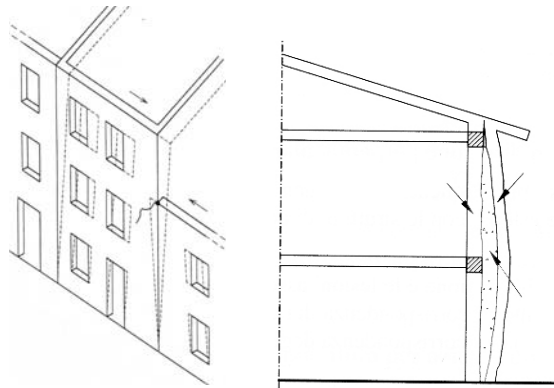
Examples of damage patterns for building belonging to historical centres.
